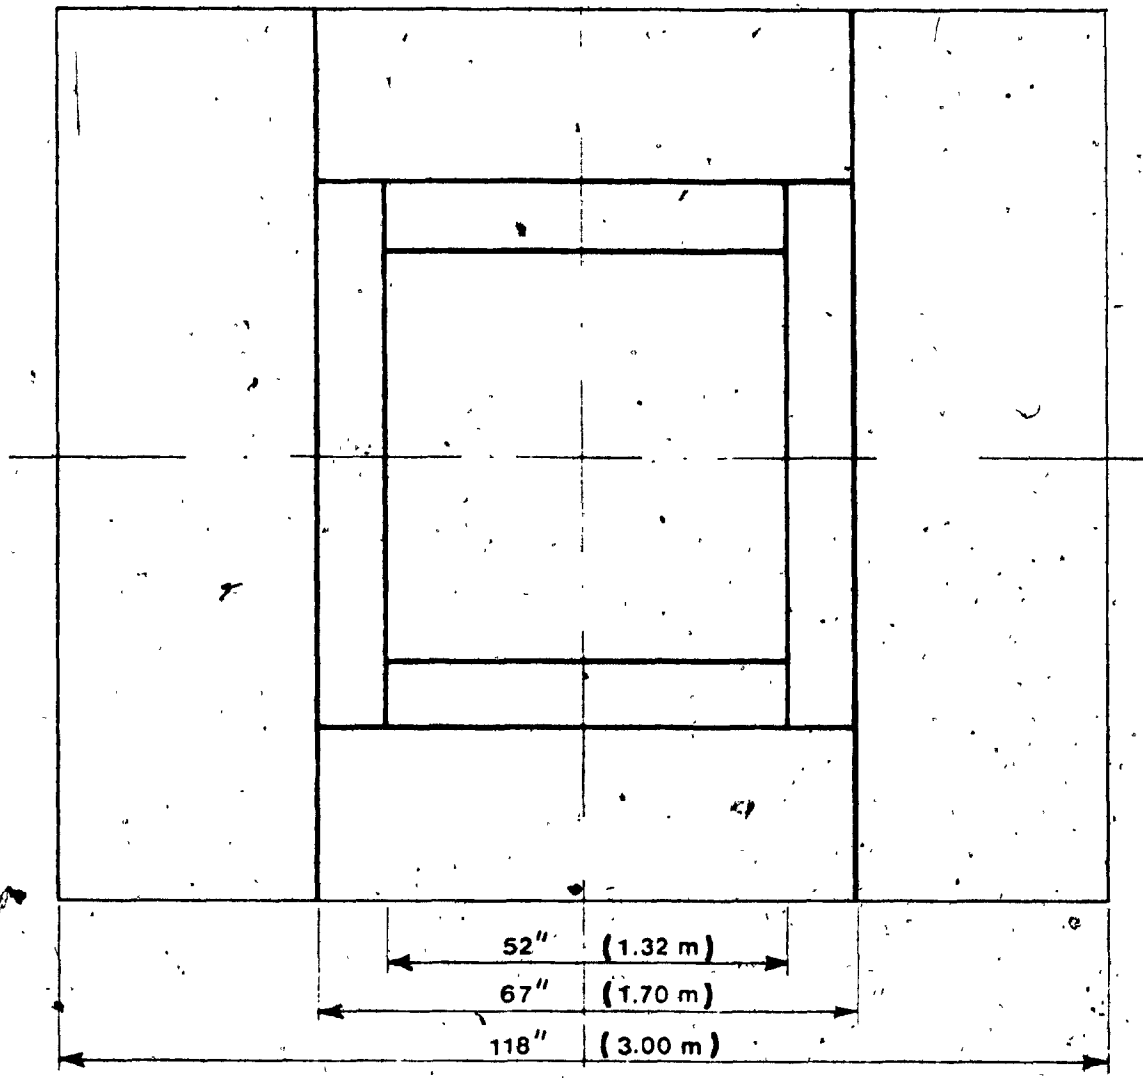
Framework Layout for Outer Wall Towards the Reception Room
